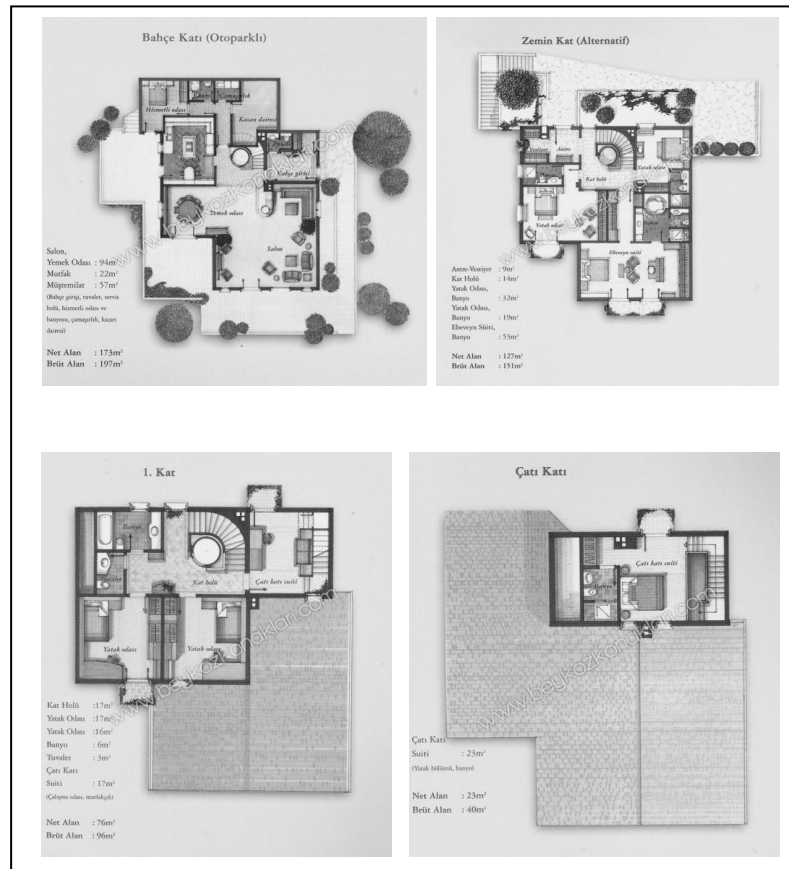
Beykoz mansions - Floor plans of b type villa, 2000s [98]
